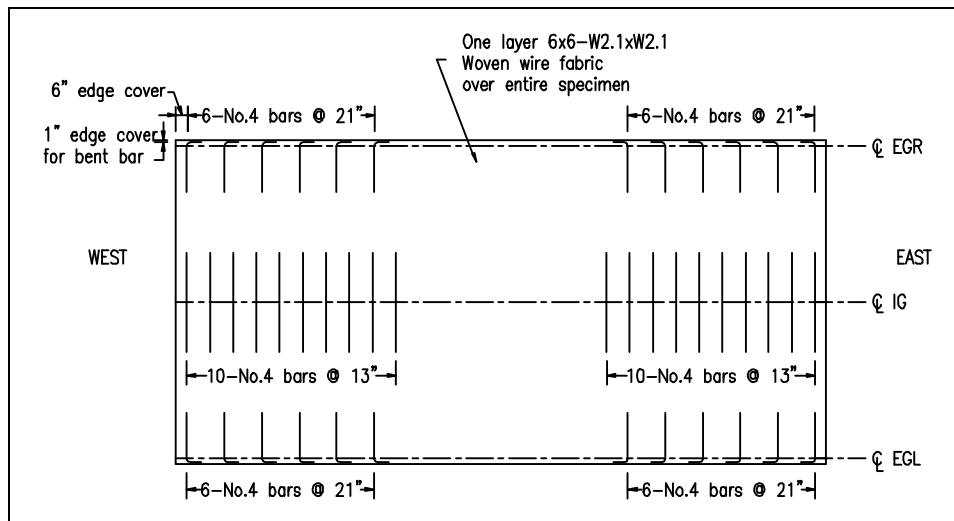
Flush Framed Girder Slab Reinforcement Layout
